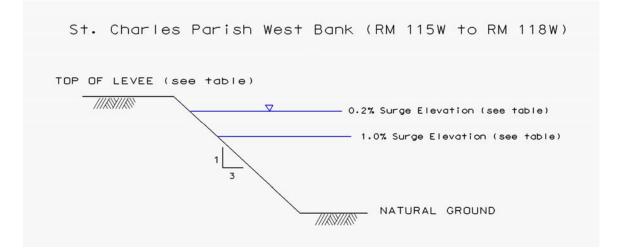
Typical Levee Design Cross-section (RM 115W-RM 118W) – St. Charles Parish West Bank
